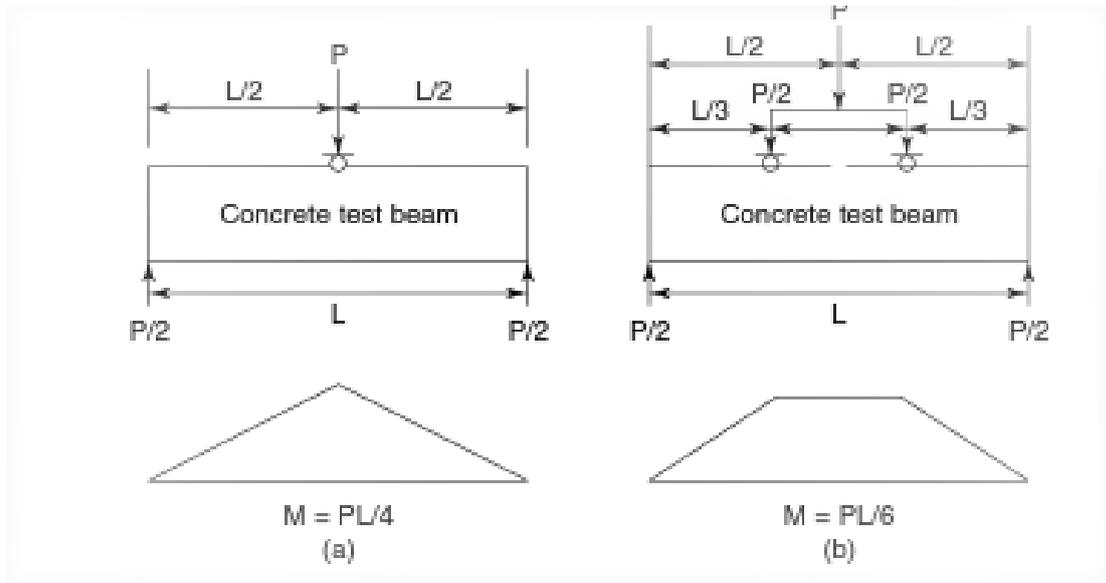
Flexural Testing (a) three-point loading, (b) four-point loading [14]
